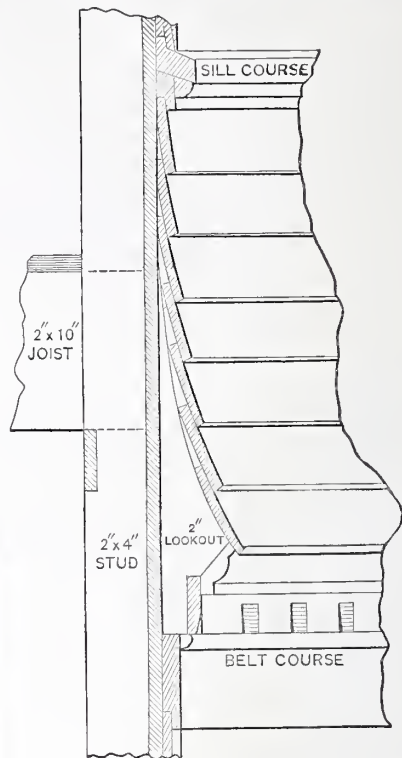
Vertical Section Through Belt Course Between First and Second Stories.—Scale, 1 Inch to the Foot.
